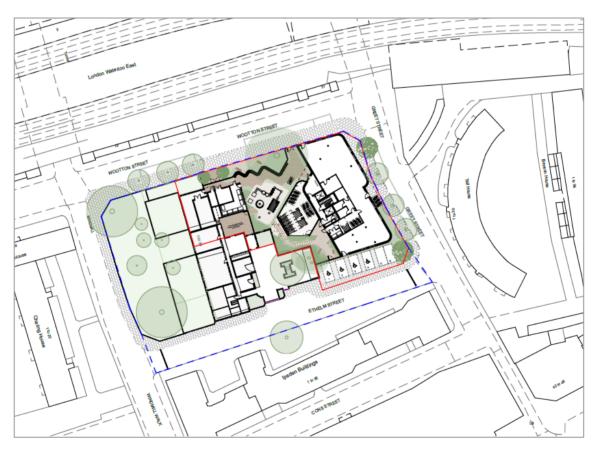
Proposed Site Layout - Stockwool Architects (December 2020)
